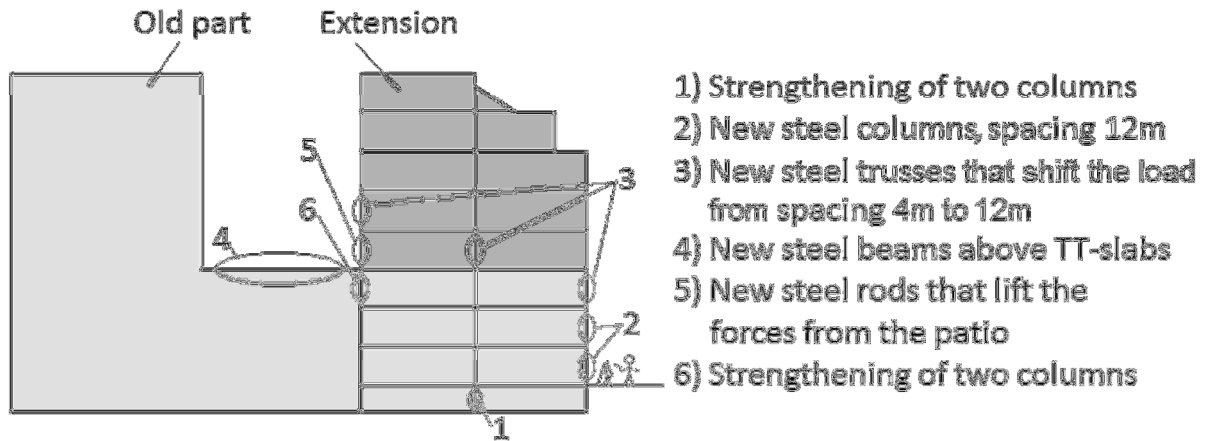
, Simplified sketch of a section through Scandic Rubinen.
